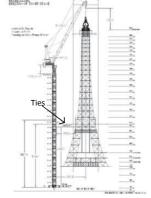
Tower crane tied to the Eiffel Tower (Eiffel Tower legs not shown).
